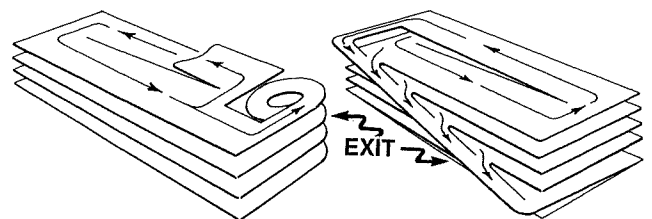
Parking garage examples that incorporate adjacent-parking ramp systems for traffic entering, and clearway ramp systems for traffic exiting the facilities.
